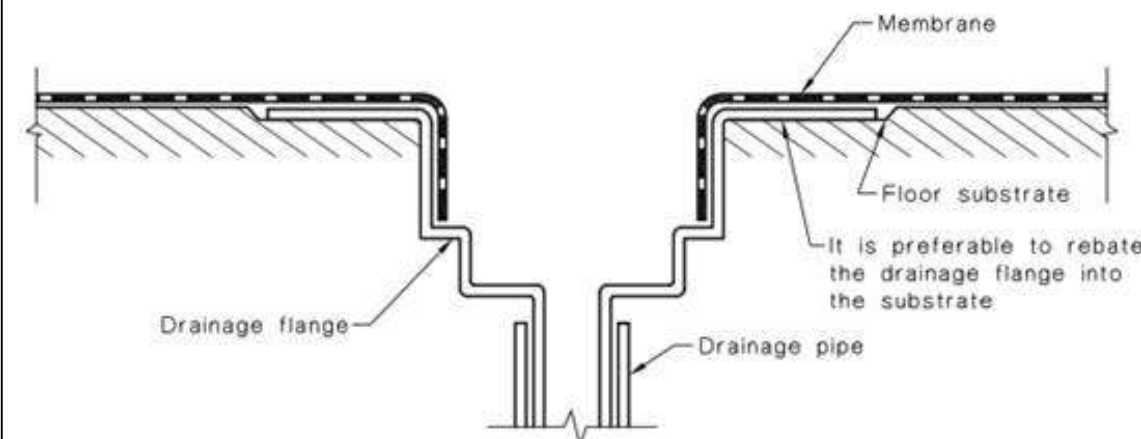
TYPICAL MEMBRANE TERMINATION AT DRAINAGE FLANGE
